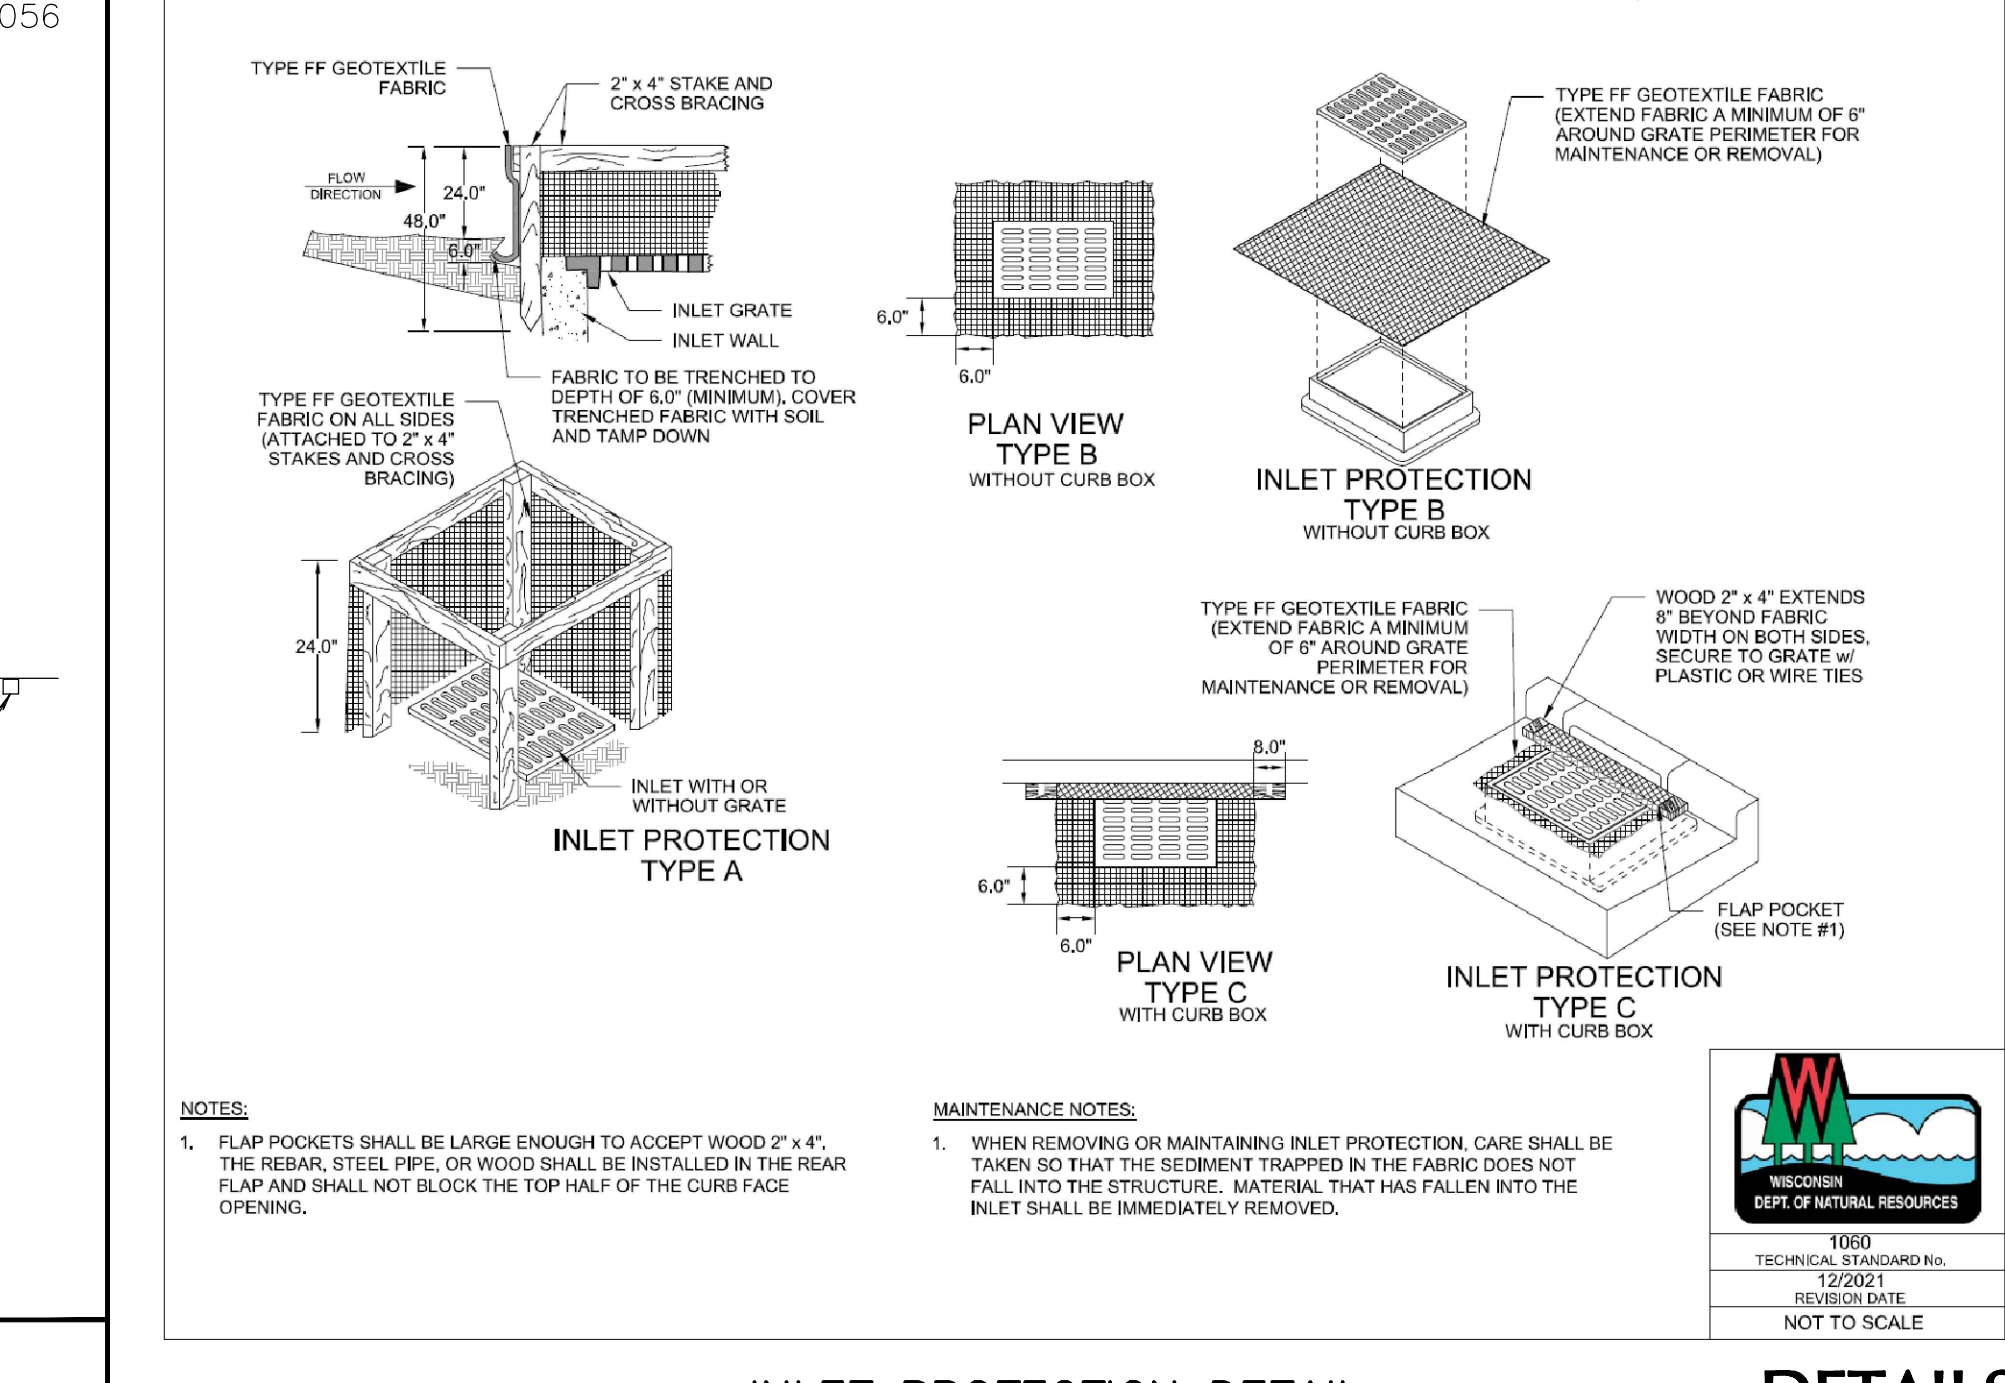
INLET PROTECTION TYPES A, B AND C
